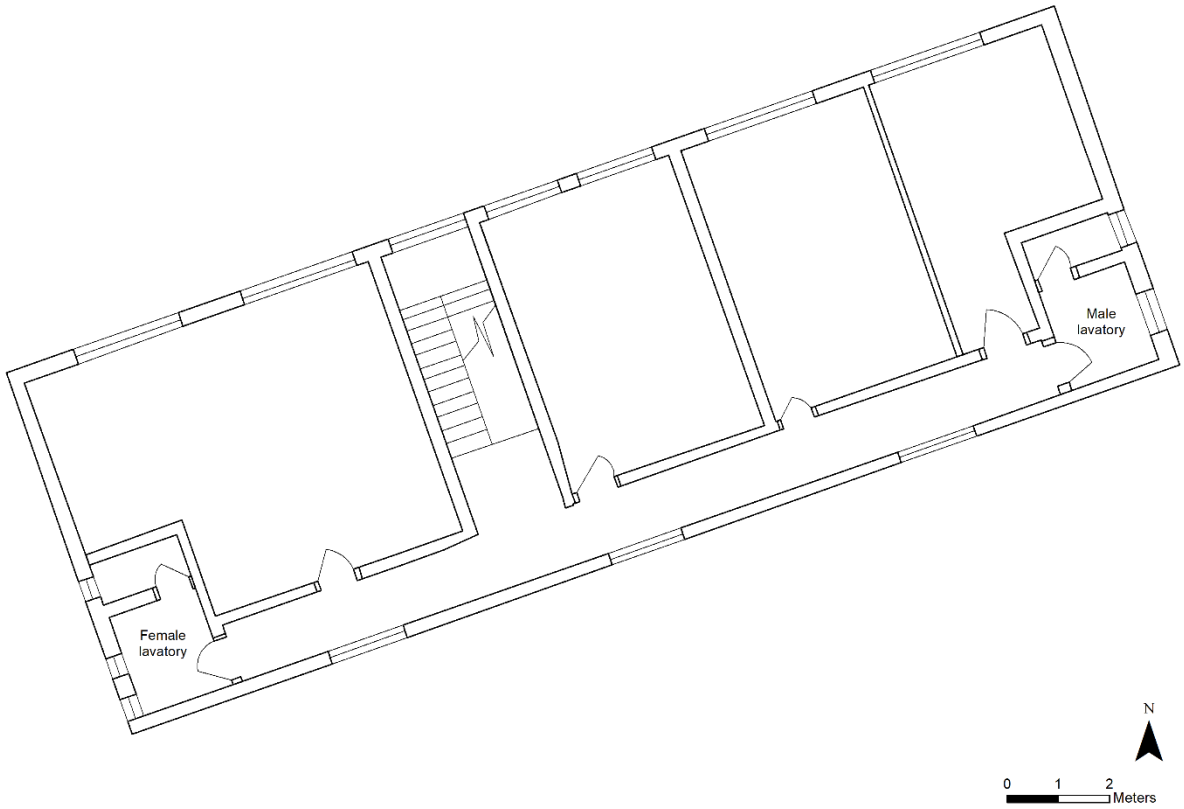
The K51 first-floor offices as built based on the building control plan TWAM CB.GA/BC/plan/NET/52.
